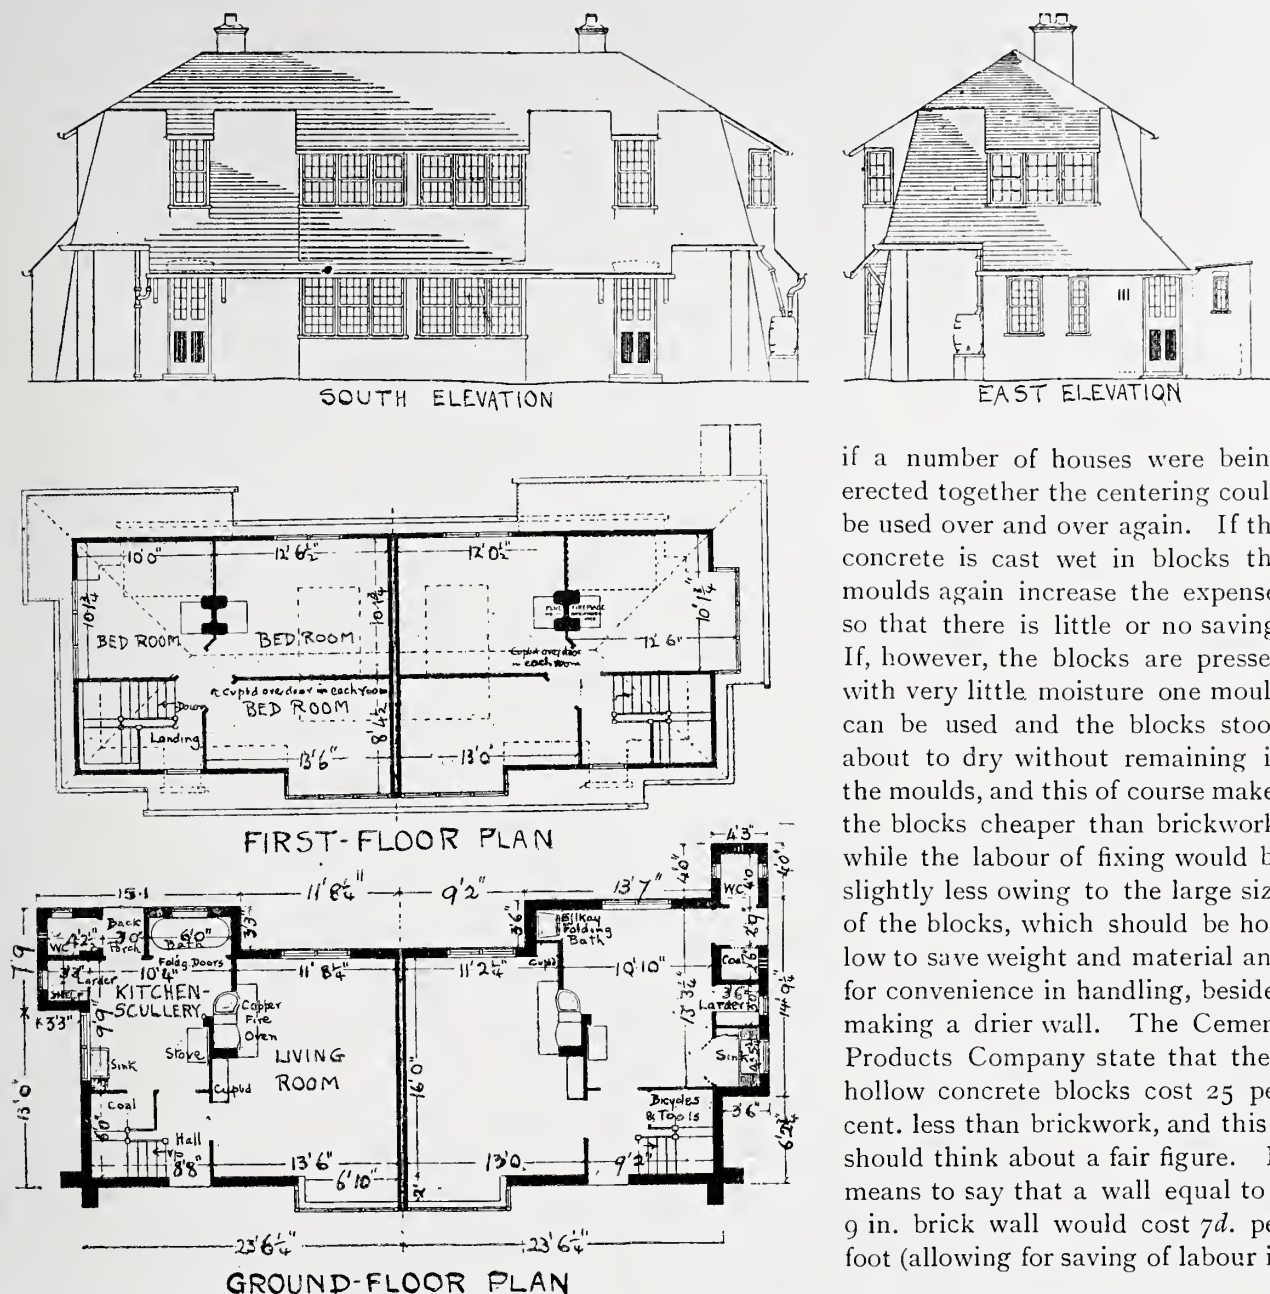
PAIR OF BRICK COTTAGES FOR THE LETCHWORTH BUILDING SYNDICATE. V. DUNKERLEY, ARCHITECT.
